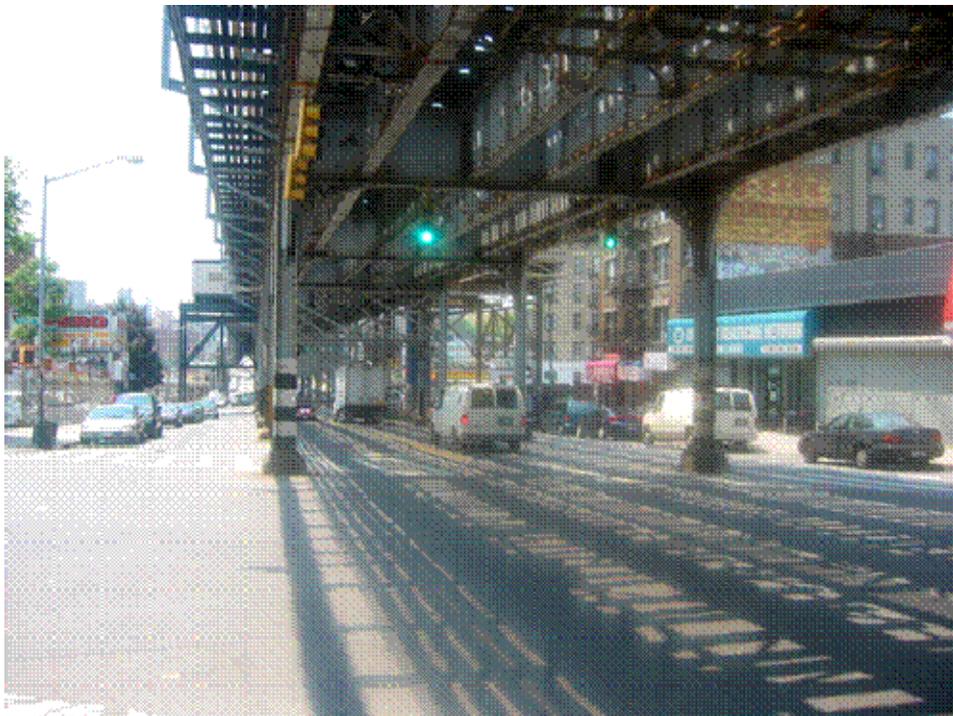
Looking west along Westchester Avenue across Tiffany Street
